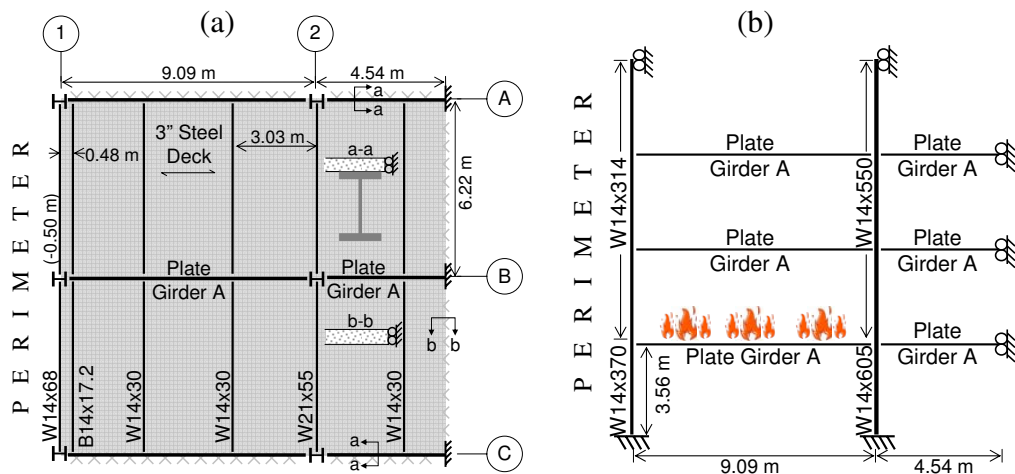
Schematics of the prototype building frame in (a) plan view and (b) elevation view.
